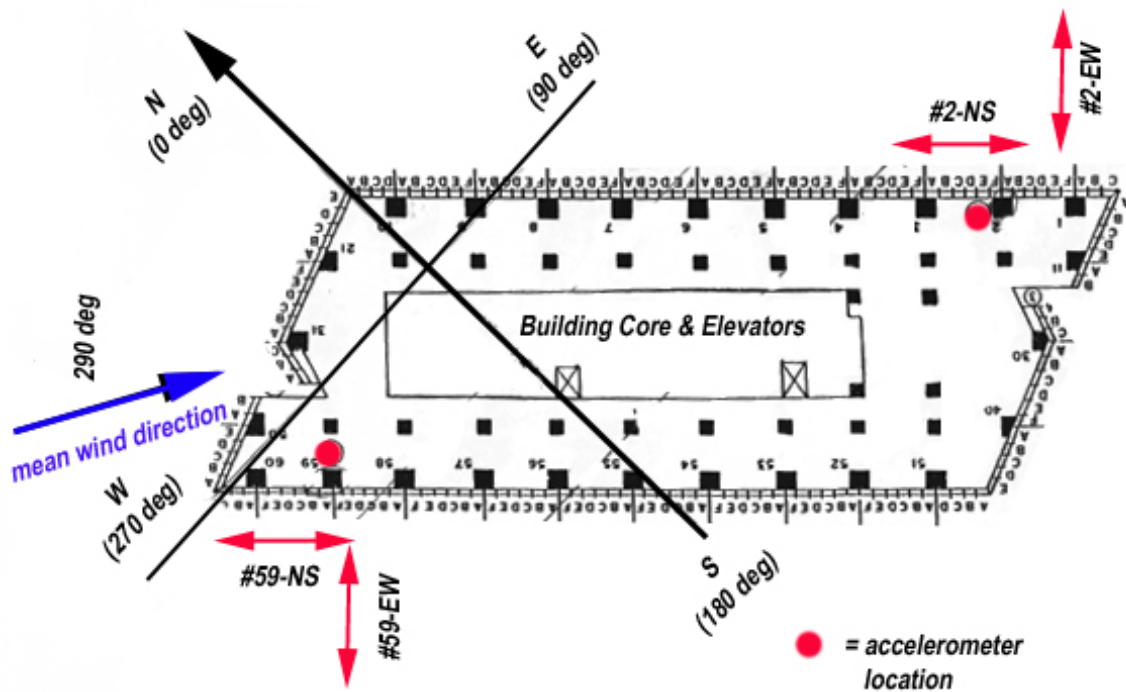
Plan view of monitored building with accelerometer locations and orientations
